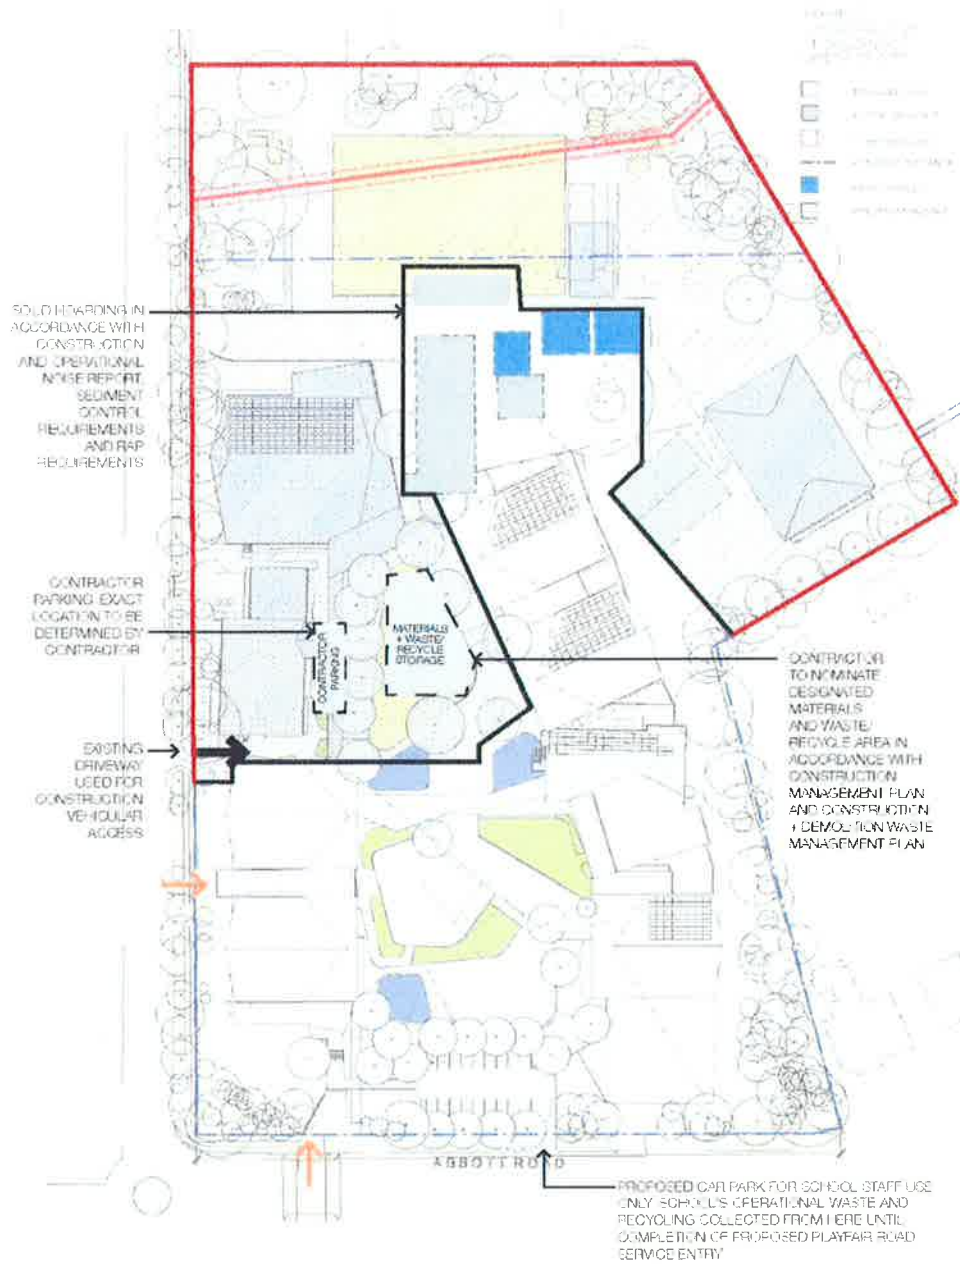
Stage 2 Construction Site Diagram. CONCEPT ONLY - Contractor to prepare final plan
